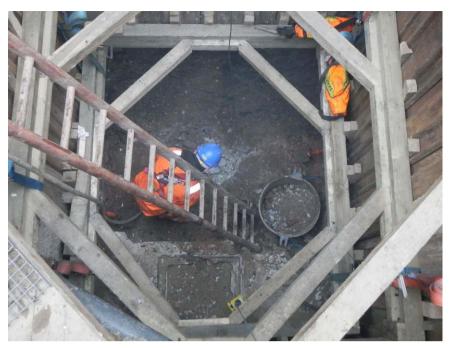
Pit 1 – Concrete wall foundation slab being broken out at 108.59m ATD (3.70m bGL), with a concrete backfilled manhole (centre bottom), archaeological deposit [901] (top right), south at top.
